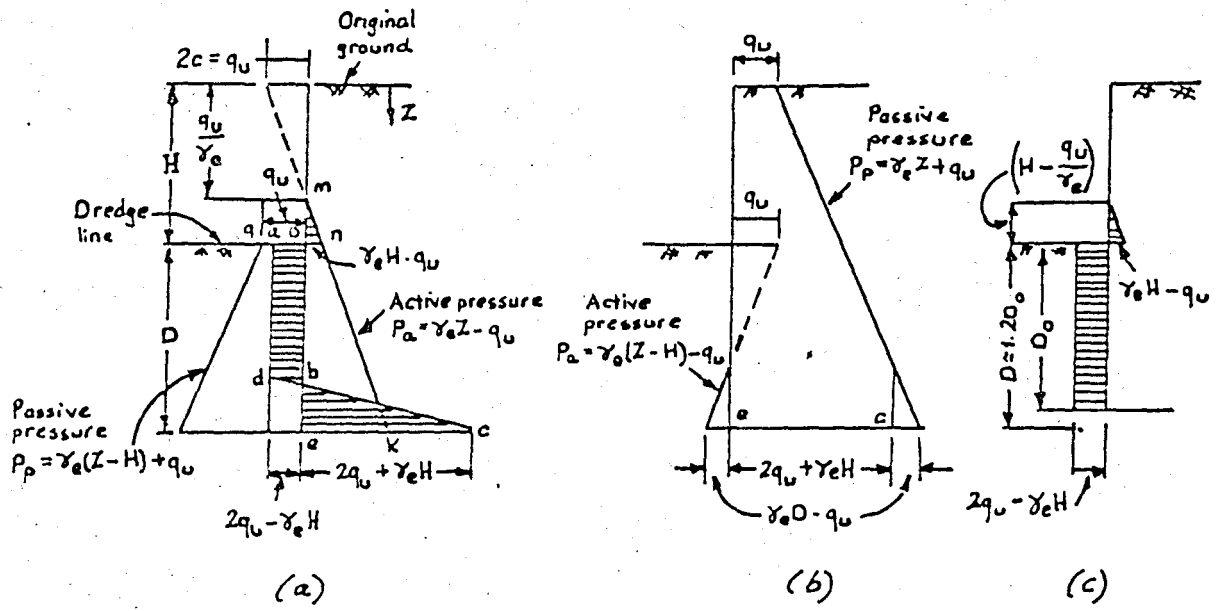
Initial Earth Pressure for Design of Cantilever Sheet Piling Entirely on Cohesive Soil (after Teng, 1975).
